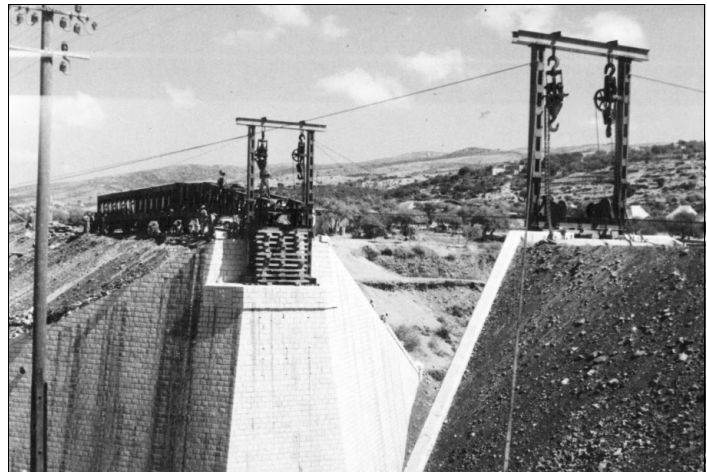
IMAGES: Although this bridge is much shorter than others shown here, there is a series of photos showing the sequence of construction of typical abutments.
